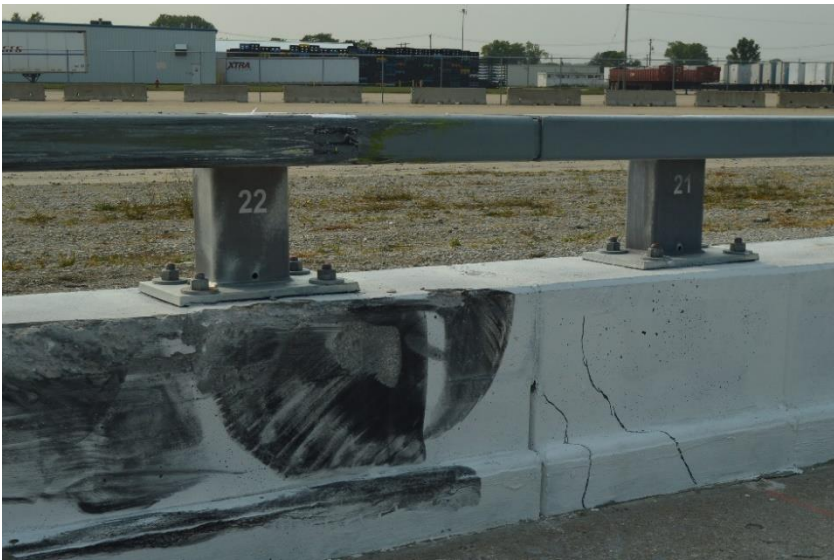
Damage on Splice between Post Nos. 22 and 21, Test No. MNCBR-2
